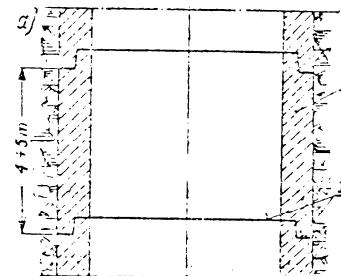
Section through the shaft with concrete lining, made with application jump form.
